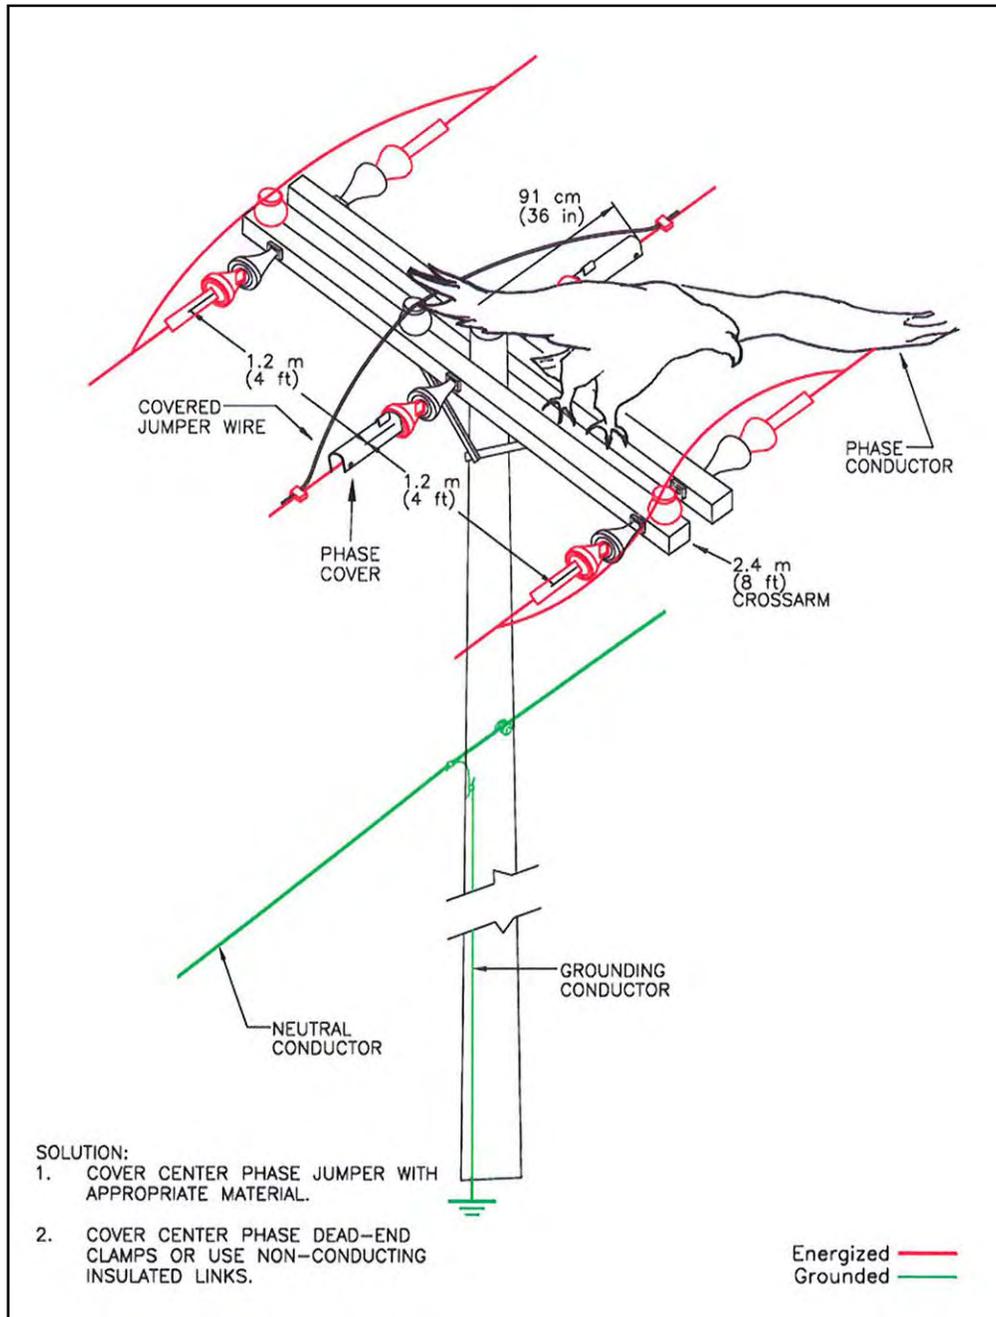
Solution for three-phase double dead-end with exposed jumper wires.
